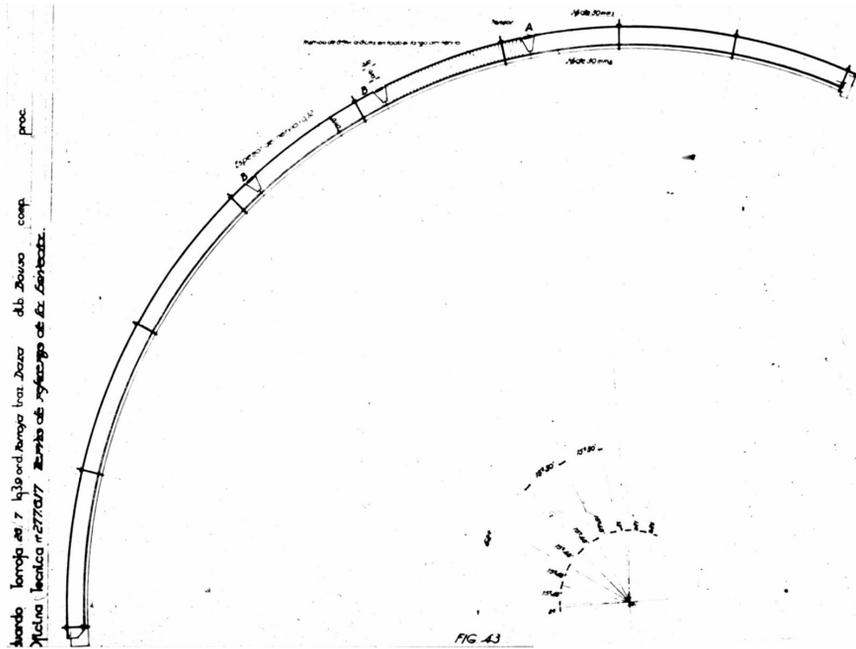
Plan of the reinforcement proposed by Torroja in July 1939 after the end of the Civil War. The reinforcement consisted of a series of stiffening beams (AET, file number 277).
